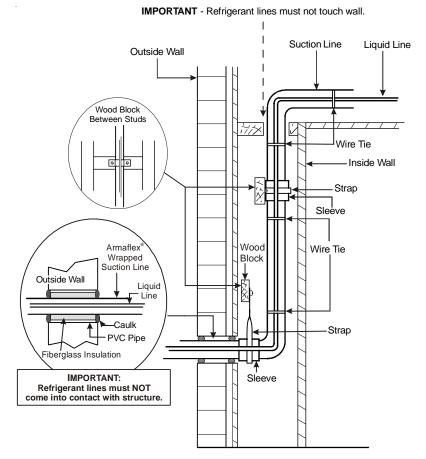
Installation of Refrigerant Piping (Vertical)
